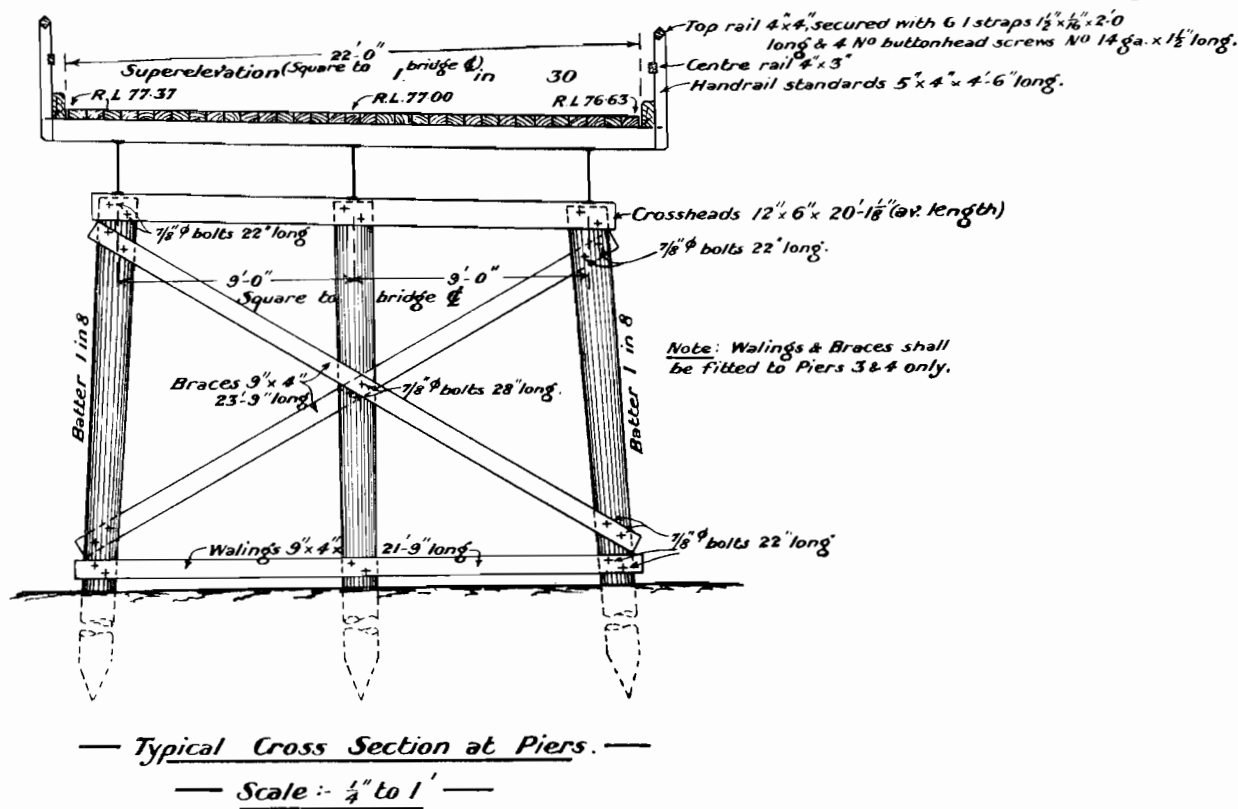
Fig. F.—Cross Section of Tarwin River Bridge over Main South Gippsland Road.
